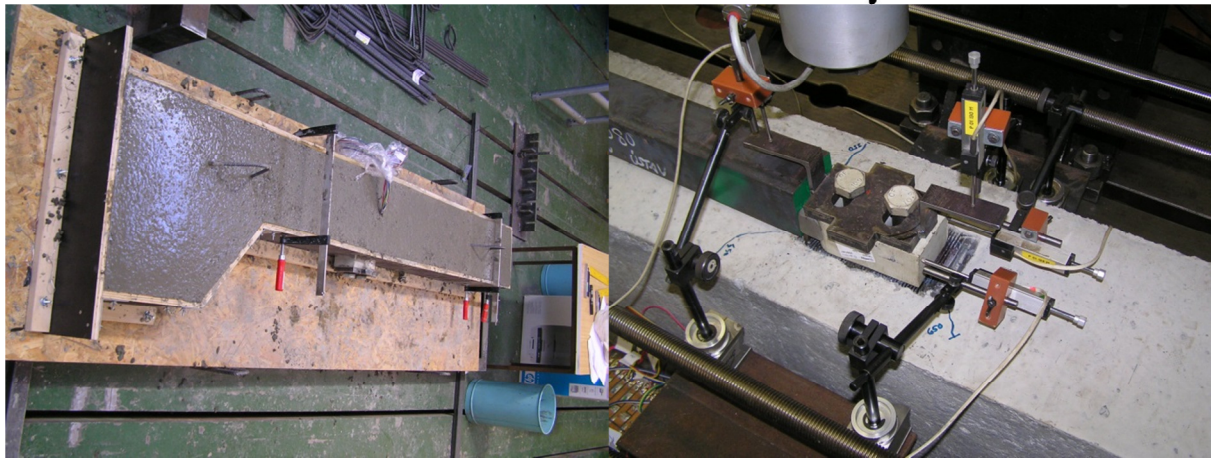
Manufacturing of experimental subtle specimen (column) for verification of cohesion of HPC and corbel of Peikko system; on the right is reference specimen from ordinary concrete at testing
